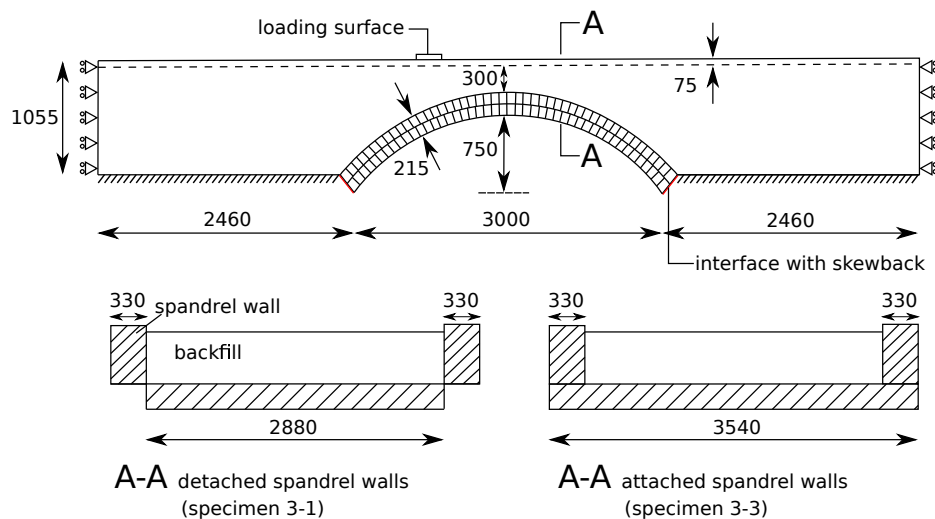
Front view and cross sections of modelled part of bridge specimens 3-1 and 3-3 (dimensions in mm).
